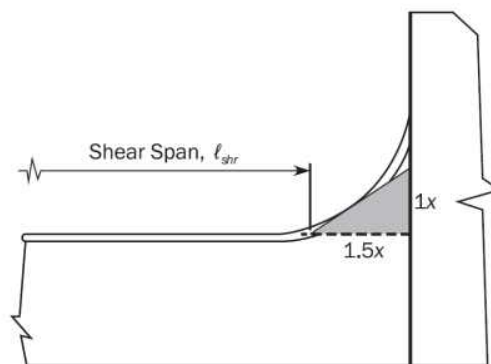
Effective shear span for local support members with continuous face plate along bracket edge
